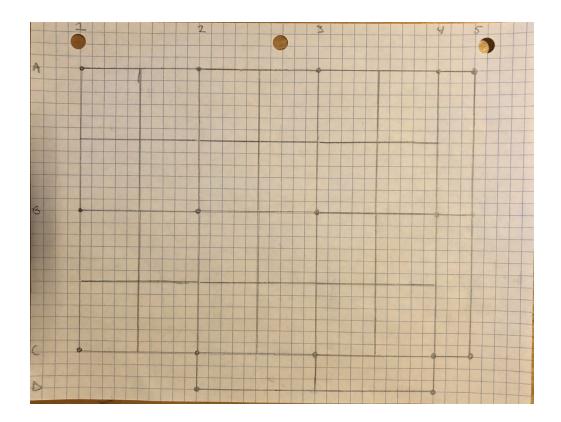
Typical Floor Framing Plan with Infill Beams
